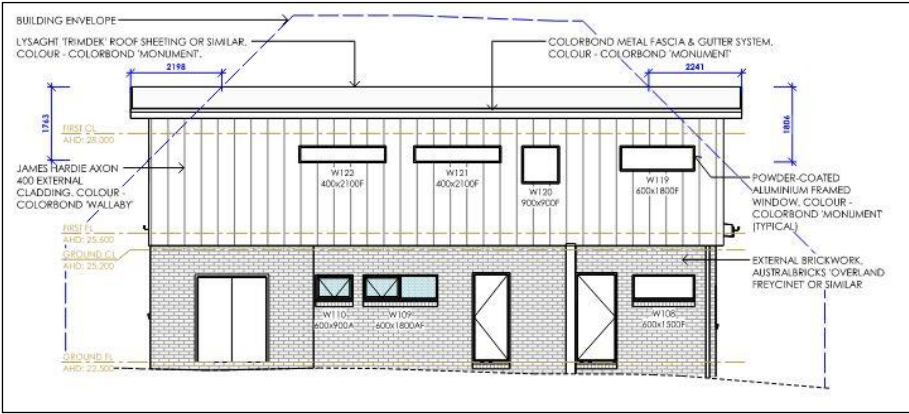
Southern elevation facing the ancillary dwelling at the rear of the site.
